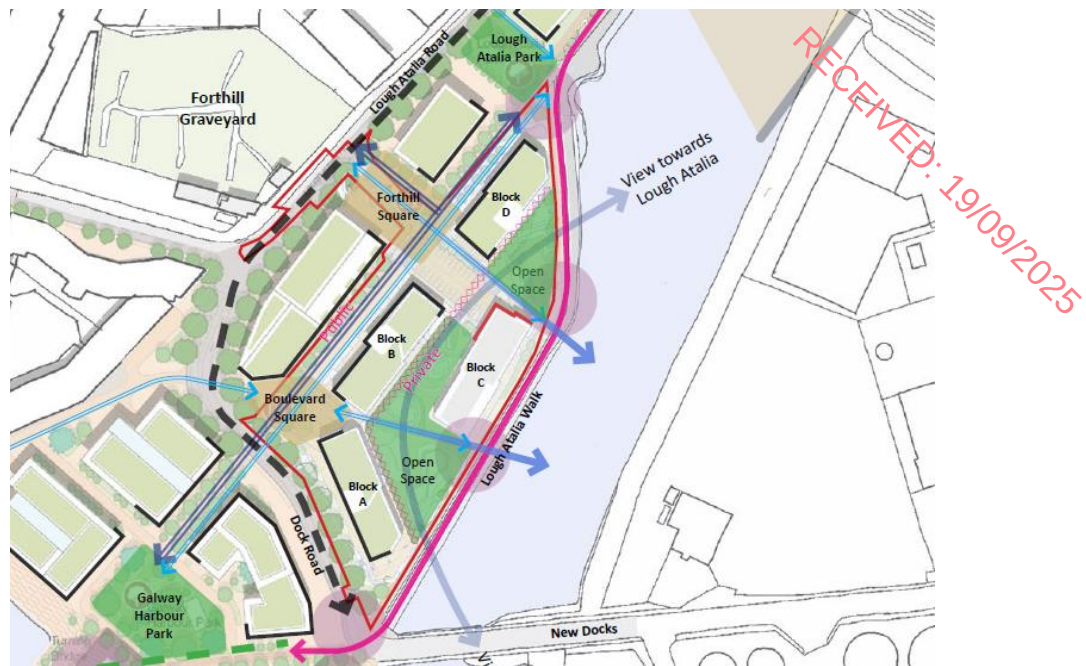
Conceptual Diagram Showing (a) the Built Frontage to Dock Road/New Docks Road to the south west and the New Street to the North West, and (b) the Formation of two Waterfront Open Spaces
